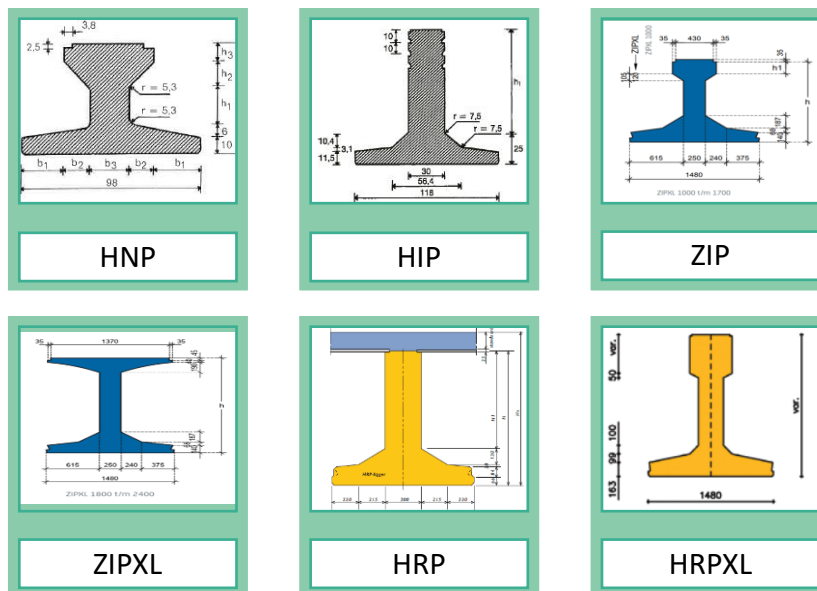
Cross sections of different inverted T-girders (Spanbeton, n.d.-a; Spanbeton, 1992; Haitsma beton, n.d.-b; Spanbeton, n.d.-a)
